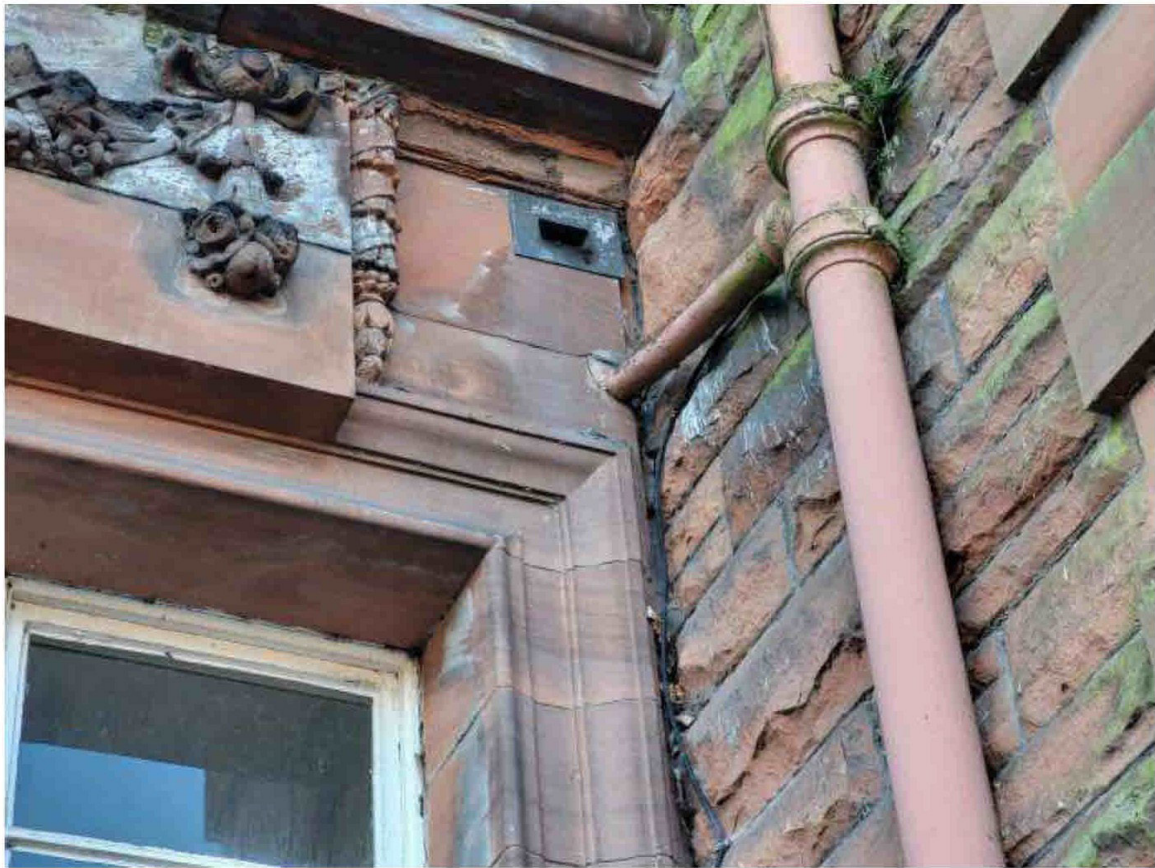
Detailed view of vent point on the west porch on the north-west facing elevation (© Graham & Sibbald 2025)
